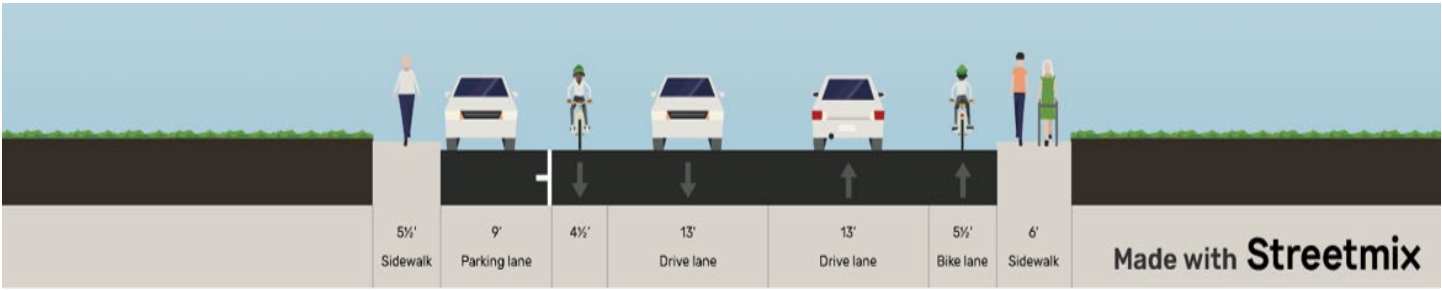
Northeast 86th Avenue from Northeast Burton Road to Northeast 30th Way has sidewalks and unbuffered bike and small mobility facilities in both directions, and a travel lane in both directions. The west side of Northeast 86th Avenue includes a 9' on-street parking lane between the curb and bike lane.
